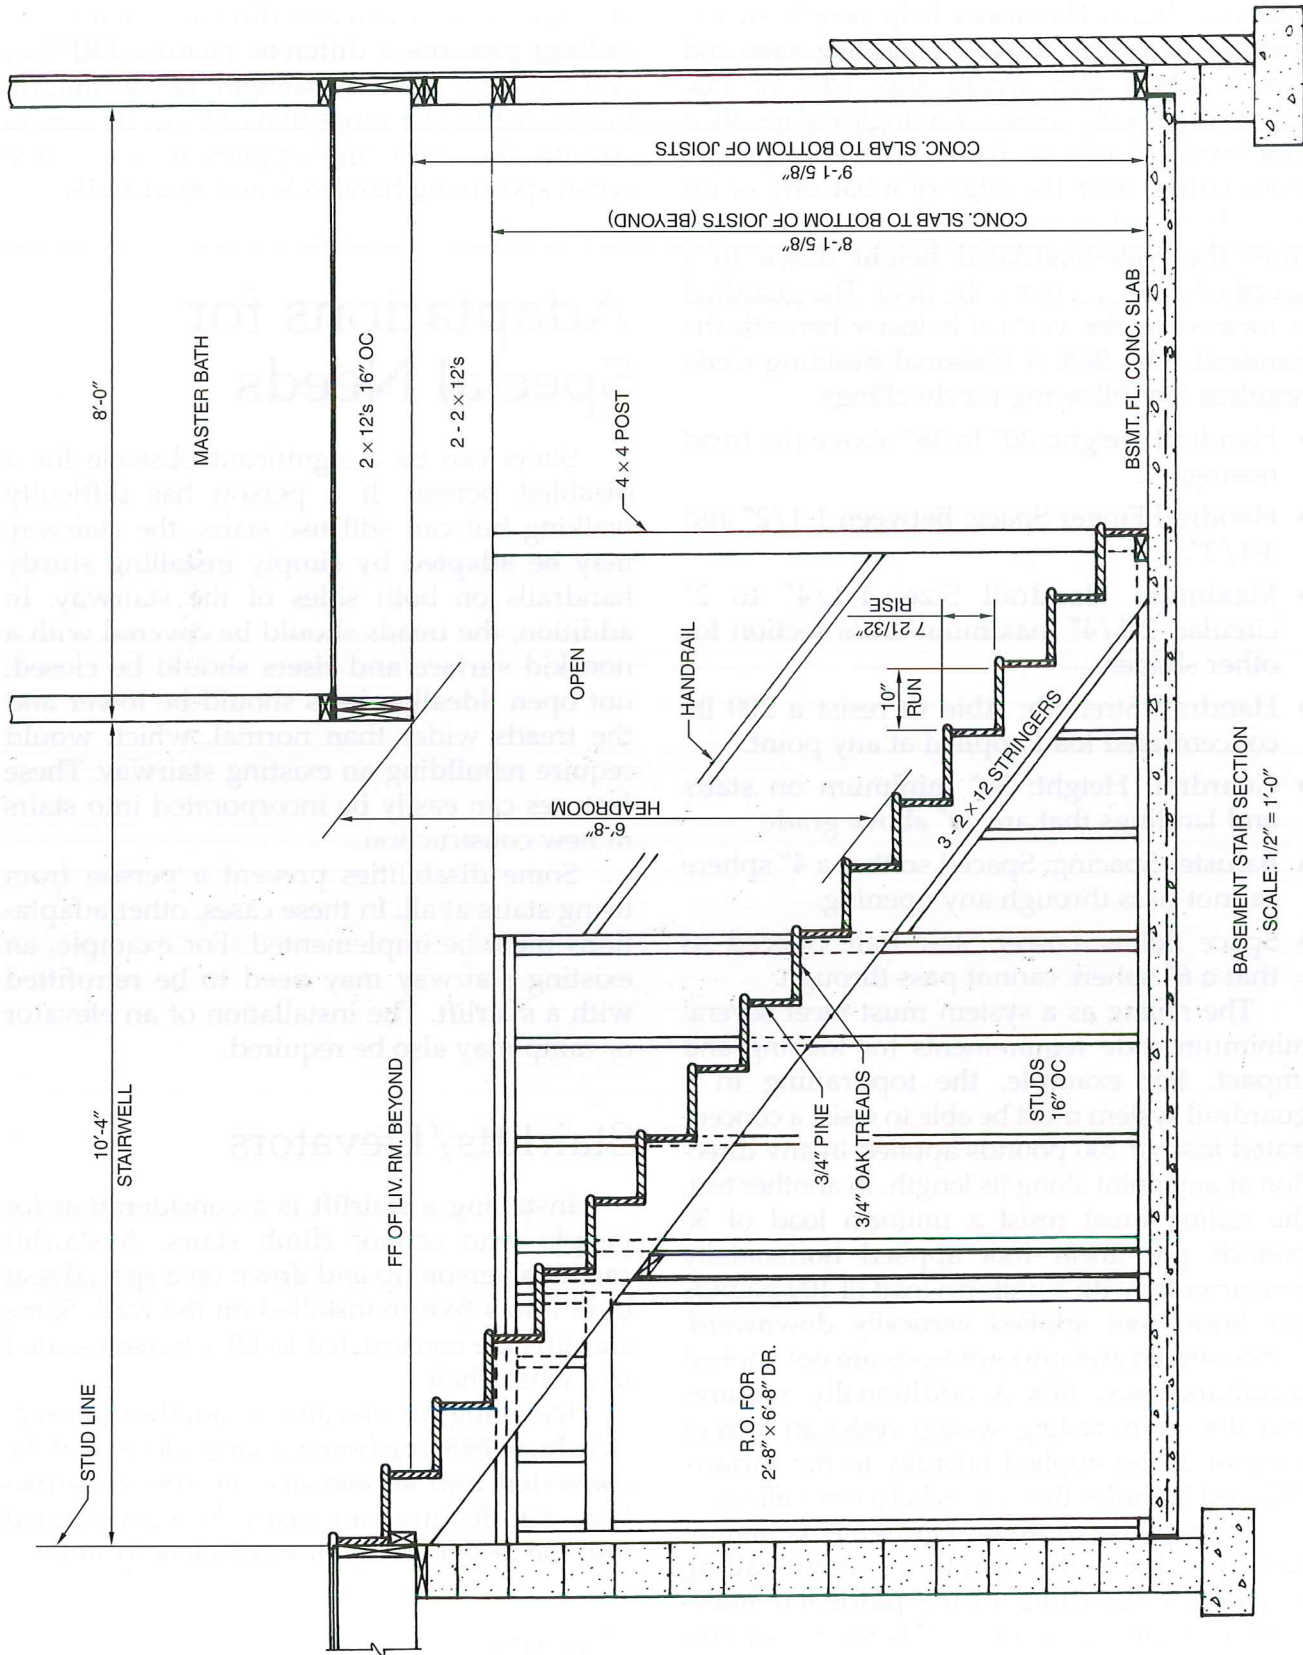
This is a typical stair detail that might be found on a set of residential drawings.
